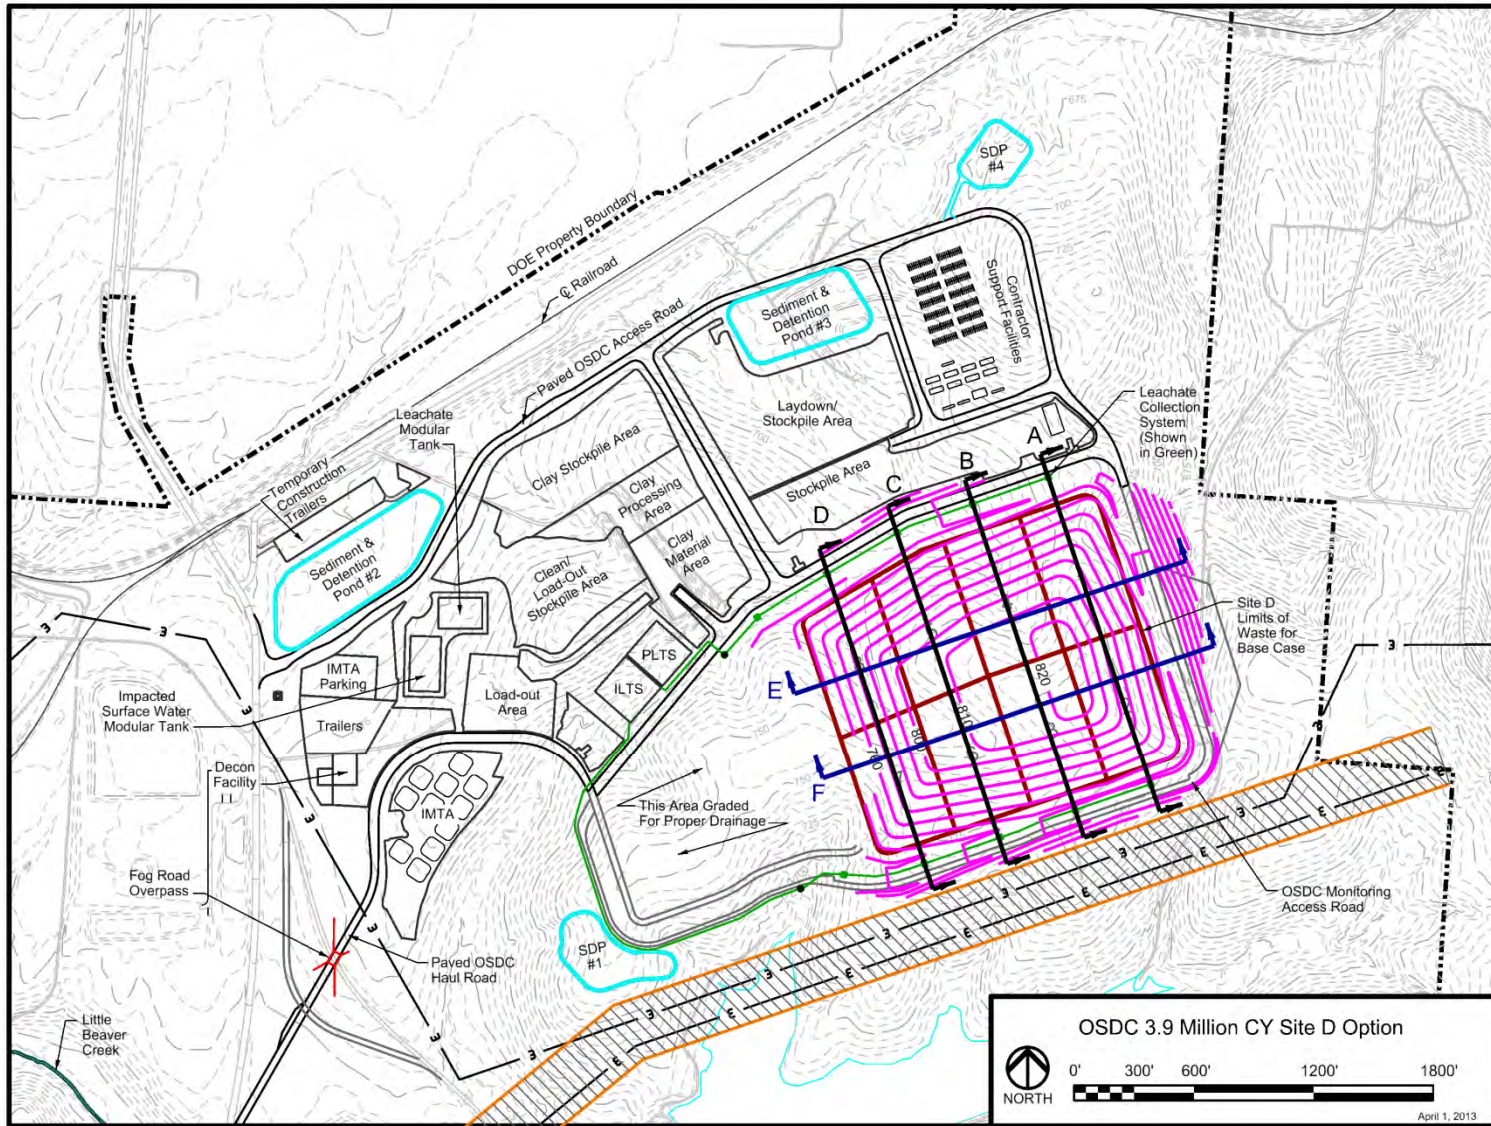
OSDC 3.9 million cy Site D Cross-section Plan
